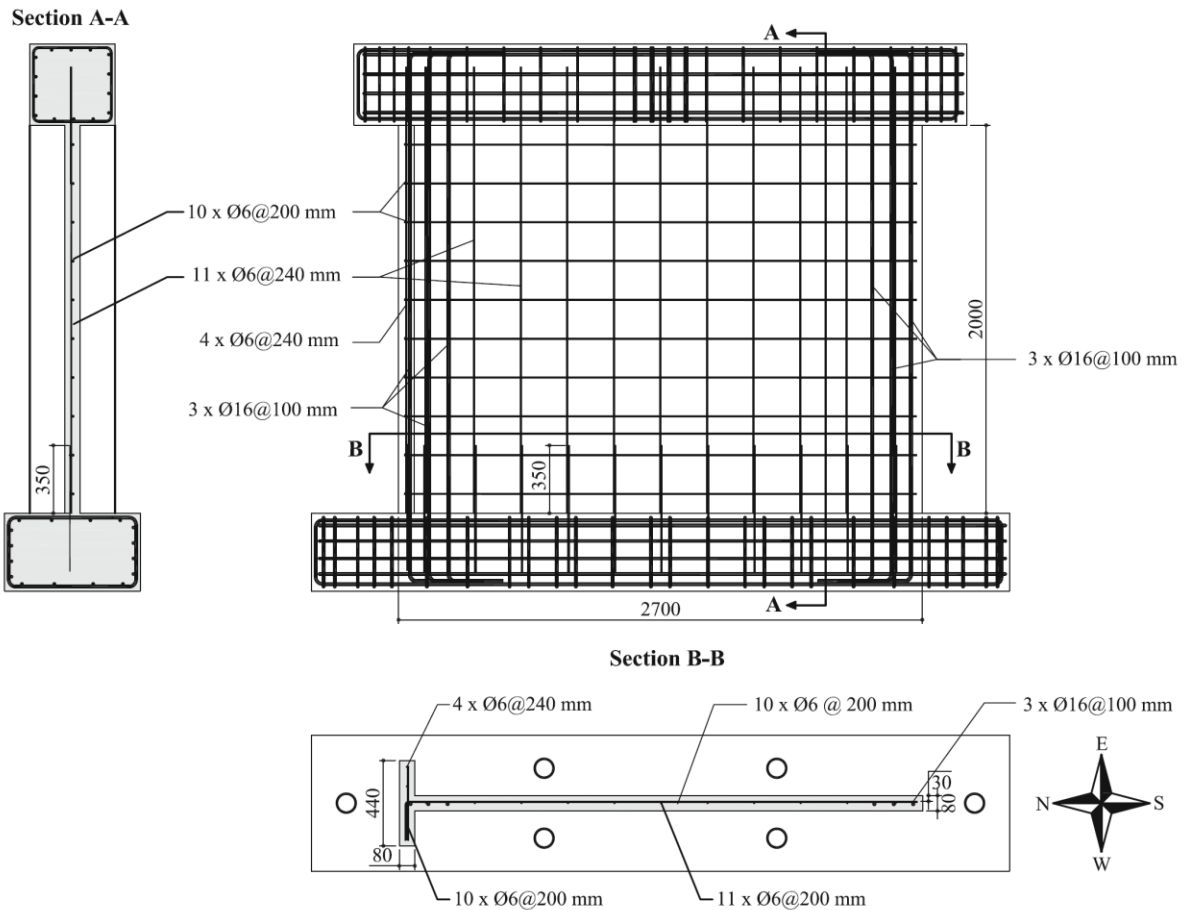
Dimensions and reinforcement layout of the test specimen (Rosso et al. 2015)
